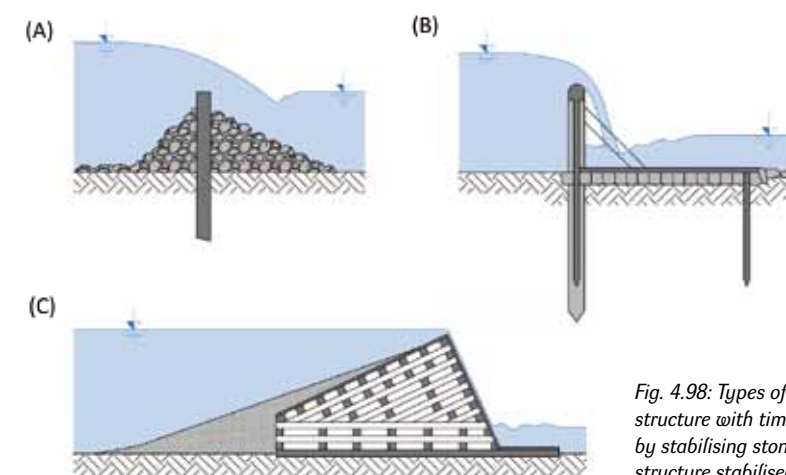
Types of timber weirs: (A) a damming structure with timber pile wall complemented by stabilising stone material; (B) a damming structure stabilised by timber struts; (C) a crib weir structure. Diagram by Radek Mišanec, 2021 (modified according to: Průcha, 1980).
